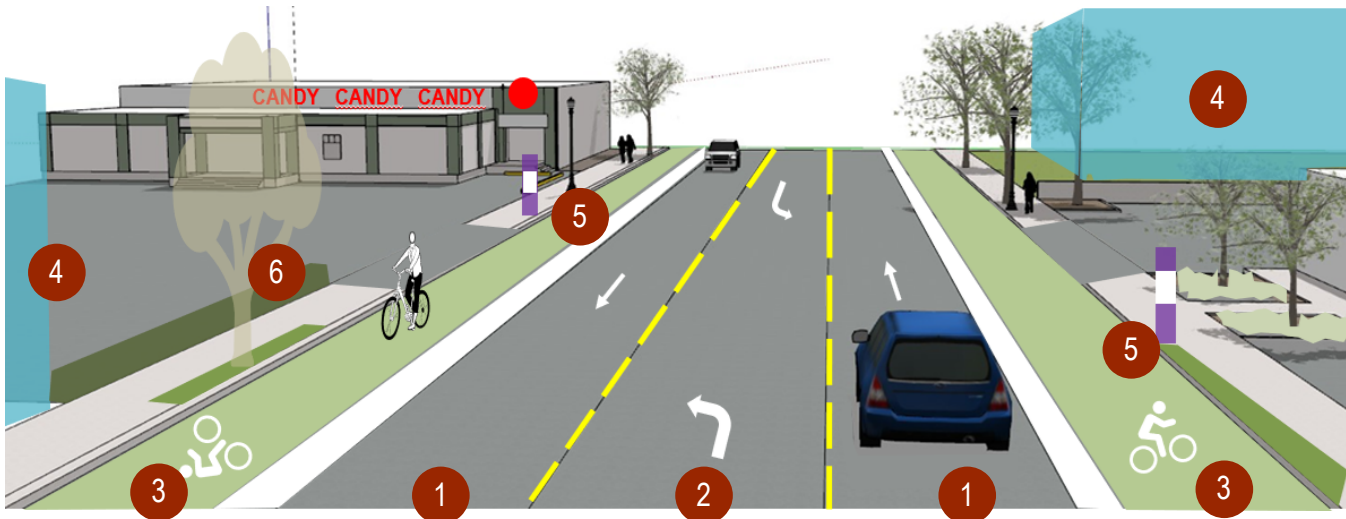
Newmark Avenue – Road Reconfiguration Street Section
